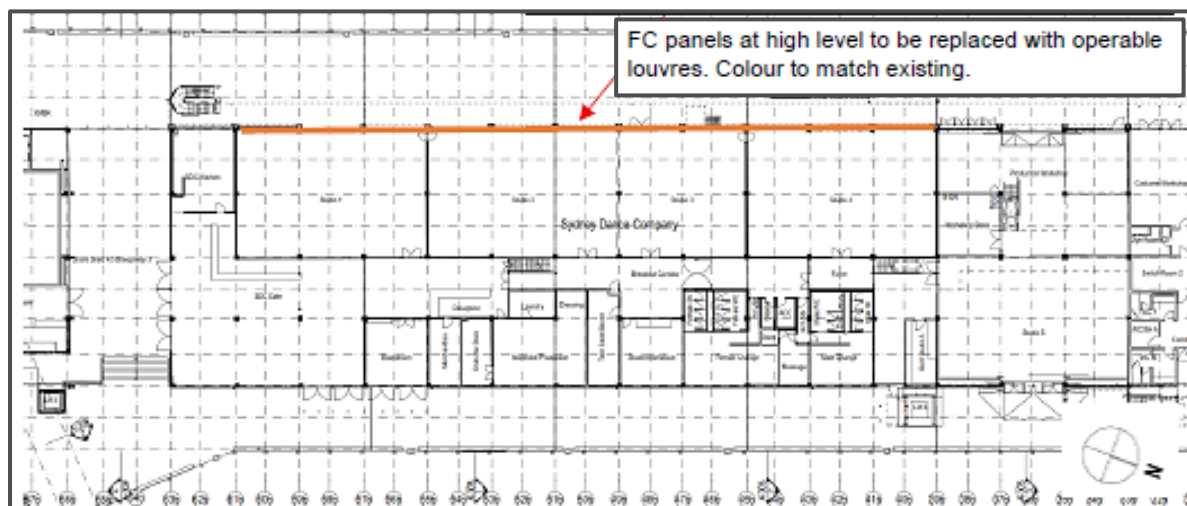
| Sydney Dance Company's tenancy floor plan with location of proposed high-level louvres in orange (source: HIS)
